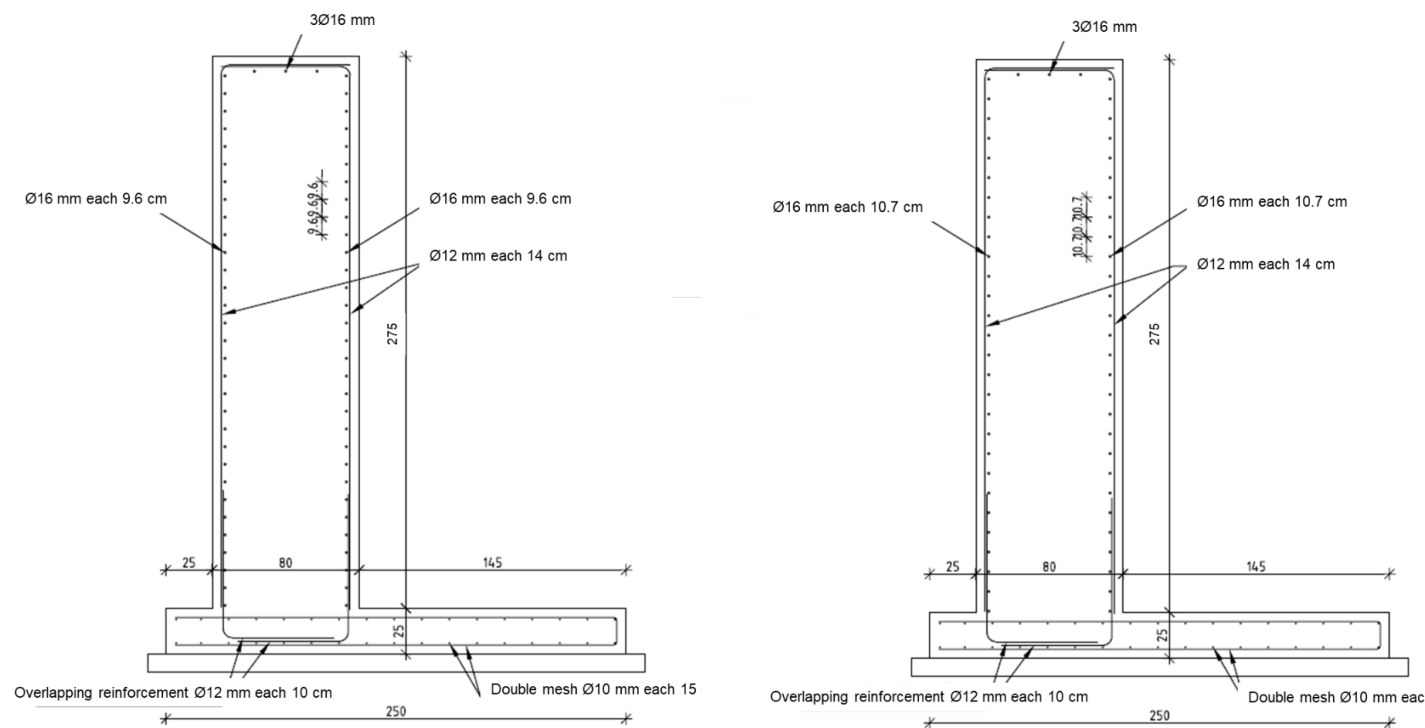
Reinforcement details of the wall REF1 (on the left) and the other walls (on the right).
